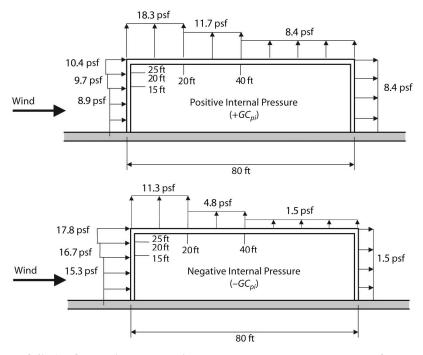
Combined design pressures for MWFRS for wind perpendicular to the roof slope and parallel to the ridge line.
